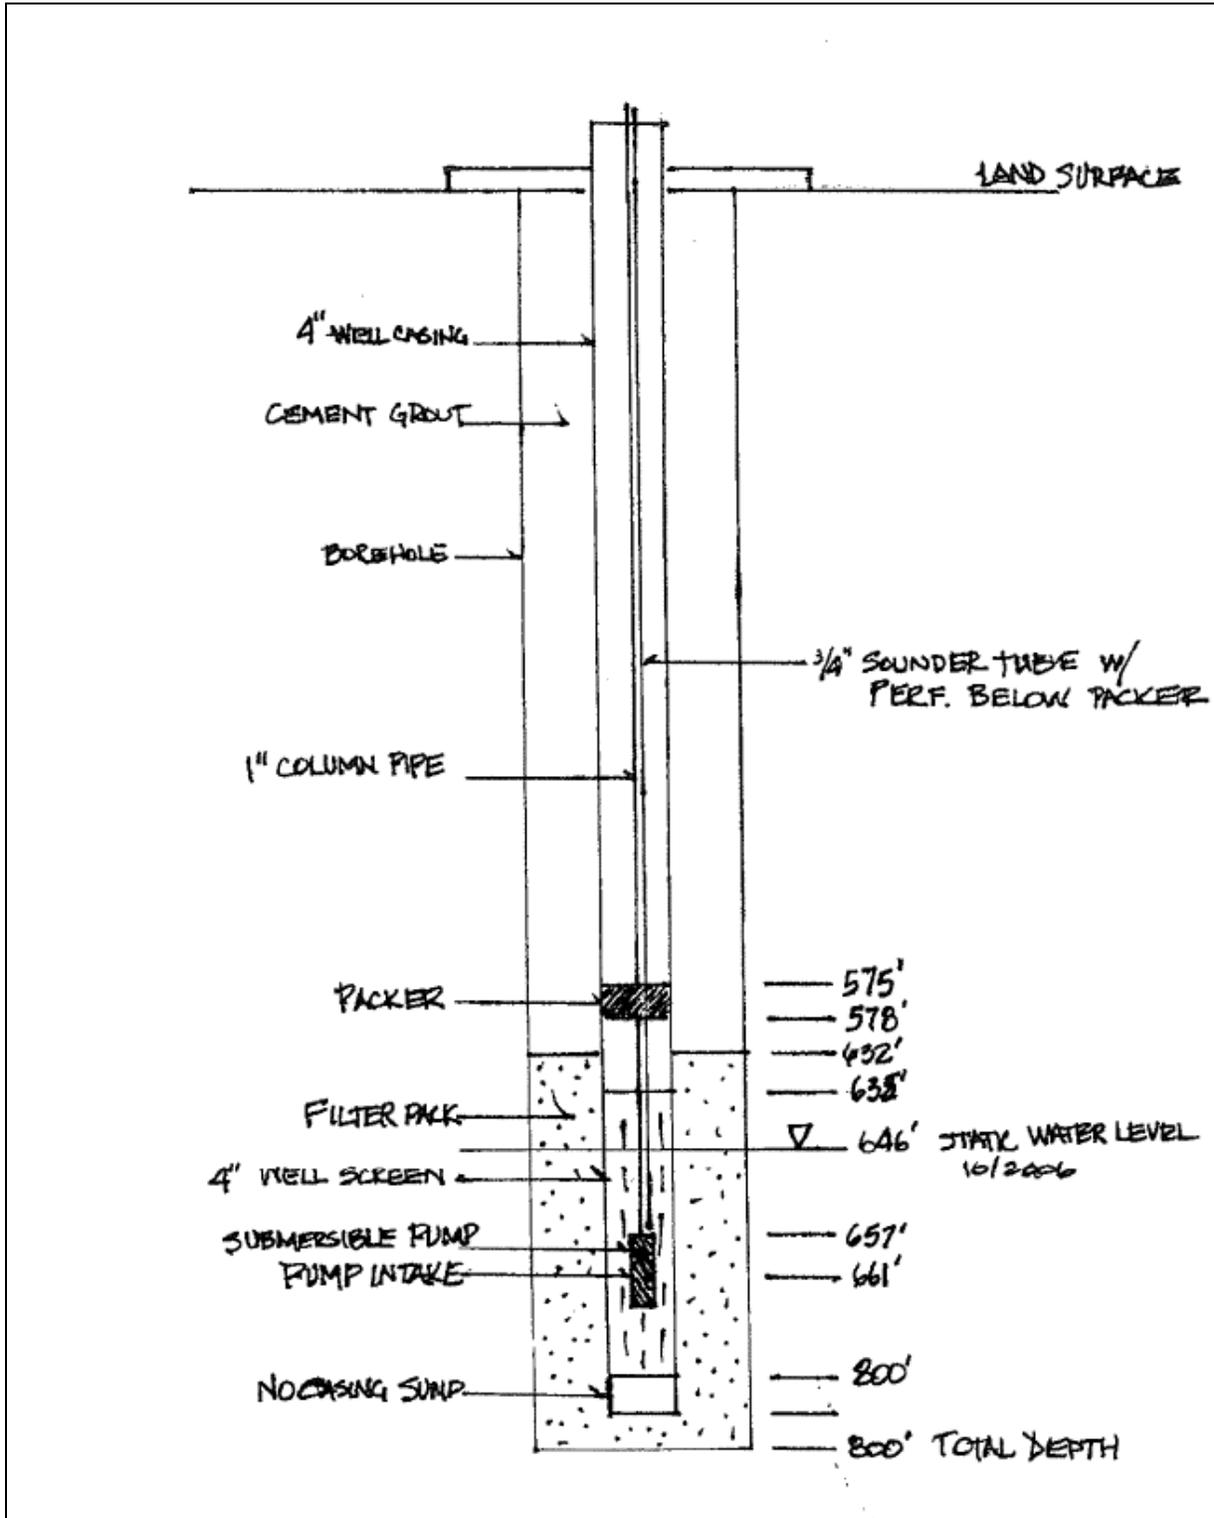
PTRL ground water monitoring well MW-2 construction drawing showing the inflatable packer installed so that the well may also be used as a soil vapor monitoring point.
